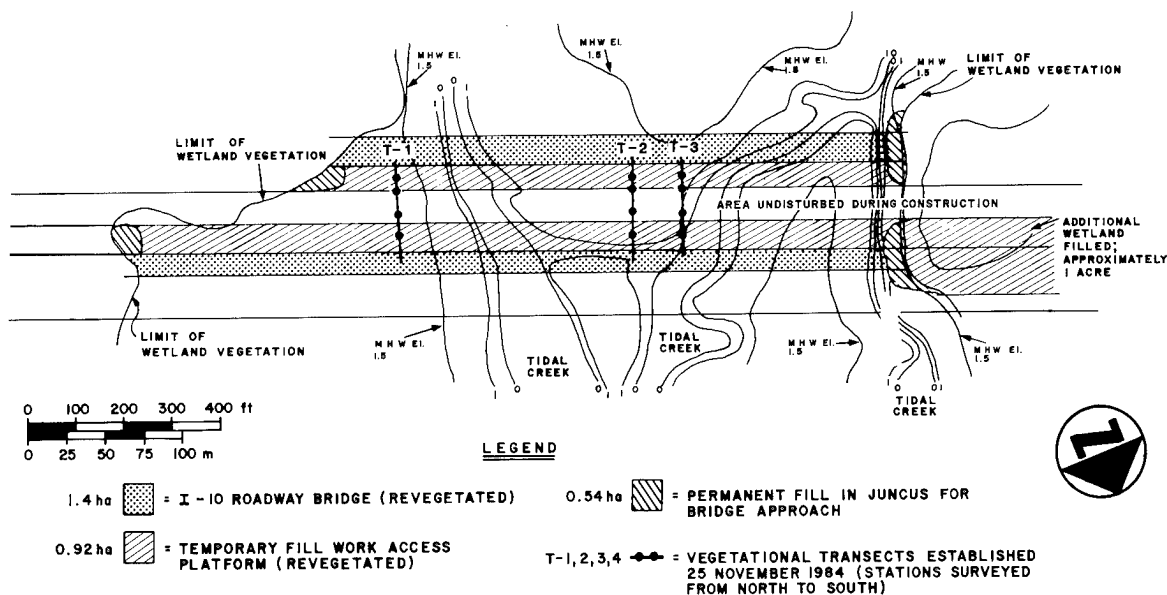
Site diagram and transects for the 25 November 1984 field assessment at the Branches Hammock site (From FDOT State Job No. 13075-3404, 16 March 1978).
